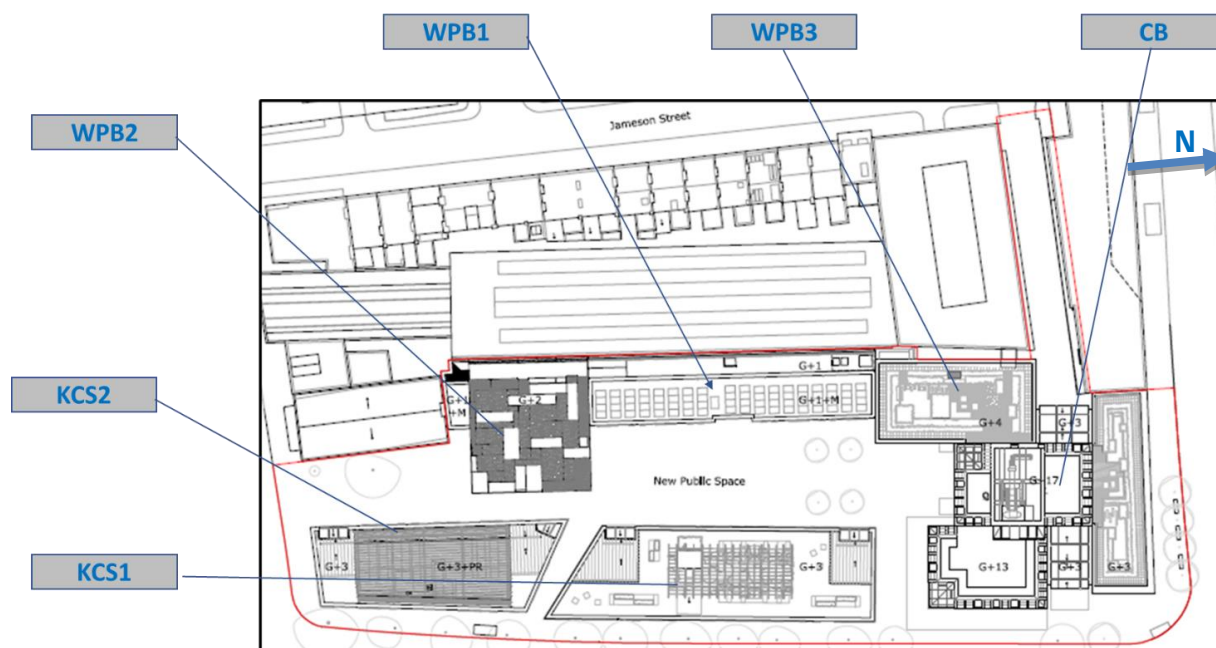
Site plan (1059 P-SITE-AA (0-J002))
